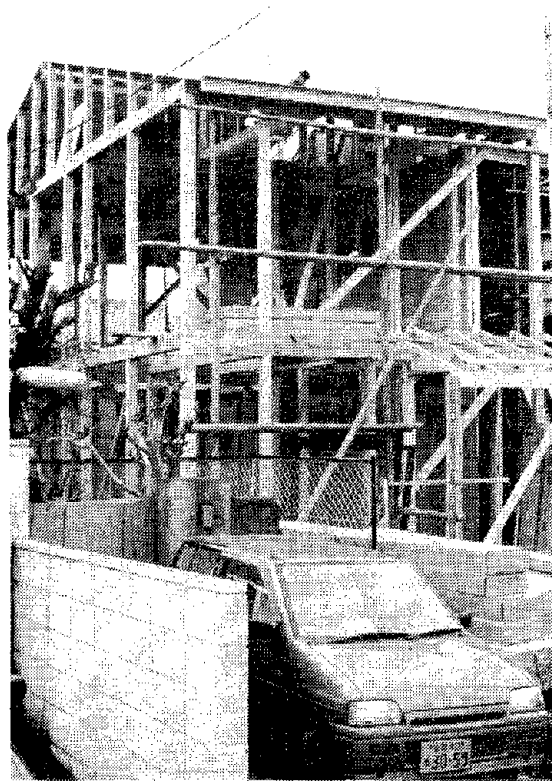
Wooden house under construction. Some diagonal bracing will probably be installed later.
